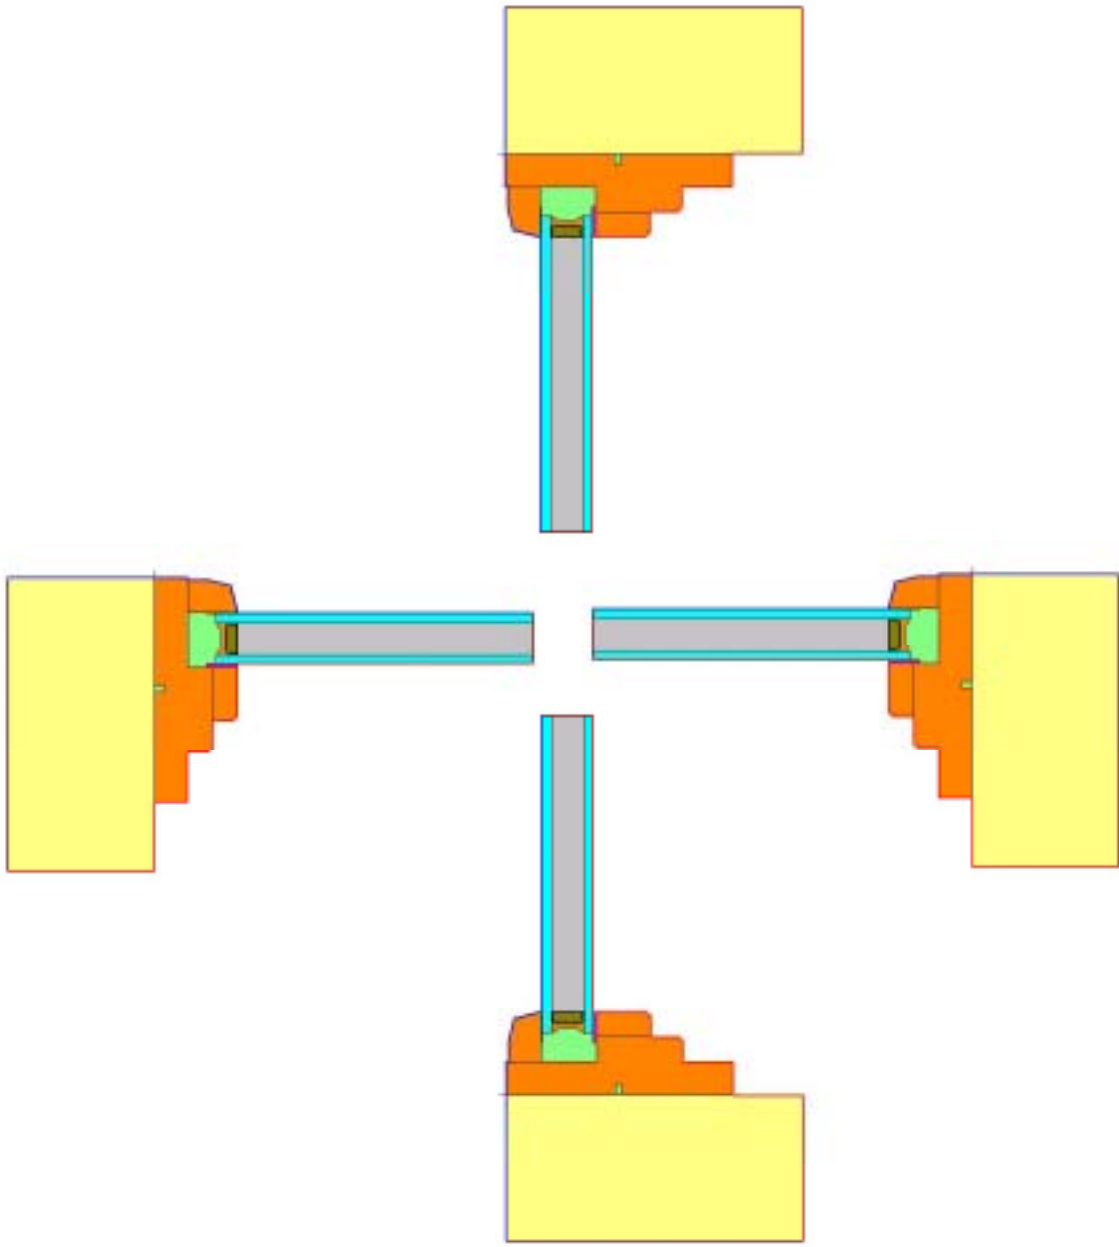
Head, Jambs and sill cross sections of the window assembly (case3)
